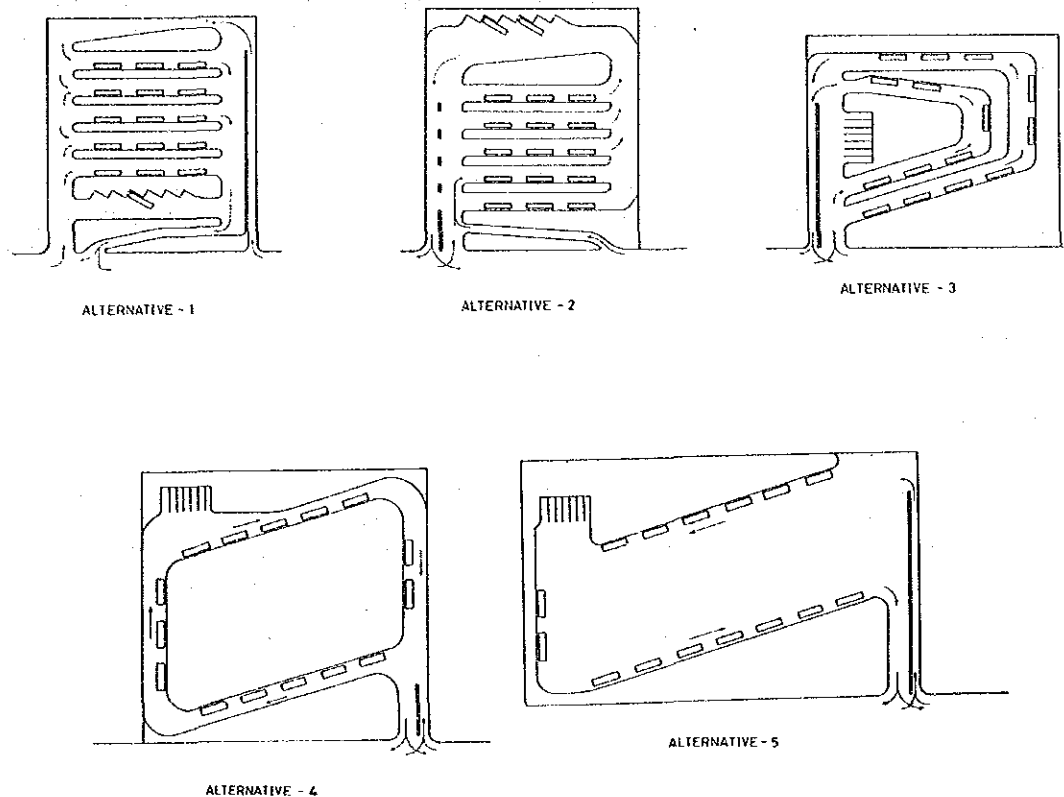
ALTERNATIVE PLANS FOR SUBURBAN BUS CENTERS
